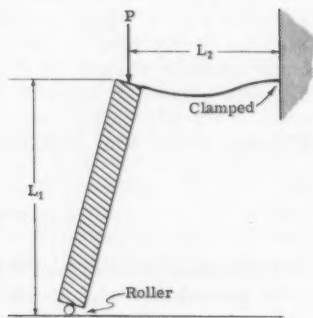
FRAME WITH ONE VERTICAL MEMBER ON ROLLERS AND HORIZONTAL MEMBER CLAMPED AT WALL
